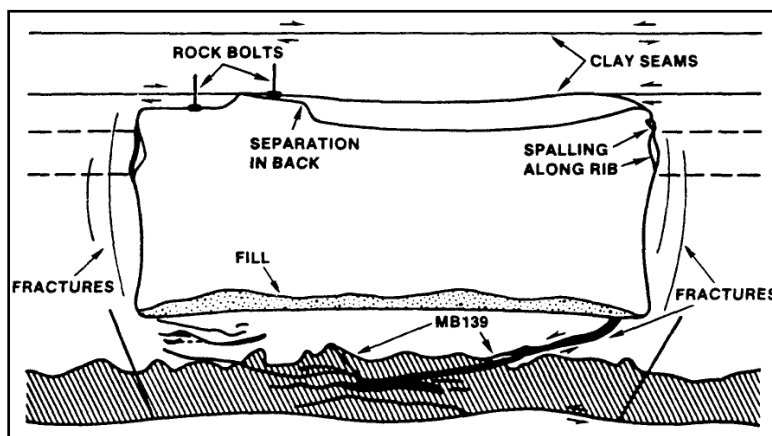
Cartoon illustrating typical damage surrounding WIPP disposal room (Borns and Stormont, 1988)
